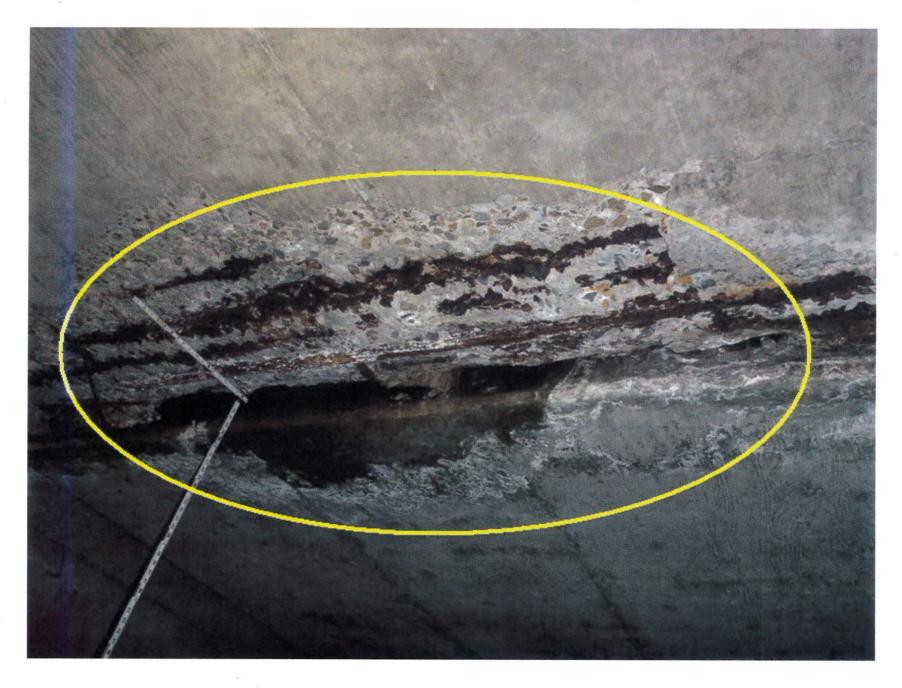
Spall 2.5 ft X 12 ft at soffit of barrel 1 at 60 feet from weste end.
